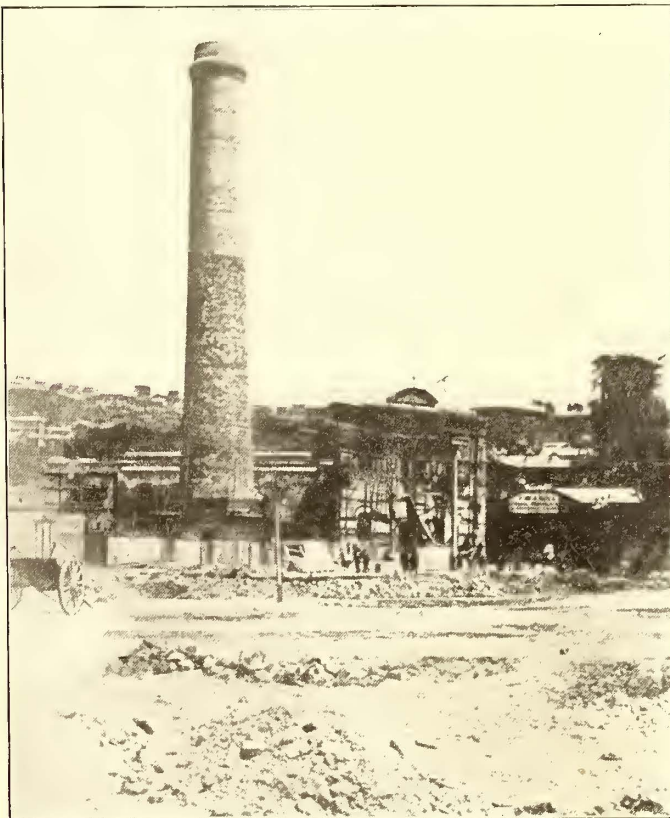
POWER HOUSE UNDER CONSTRUCTION
